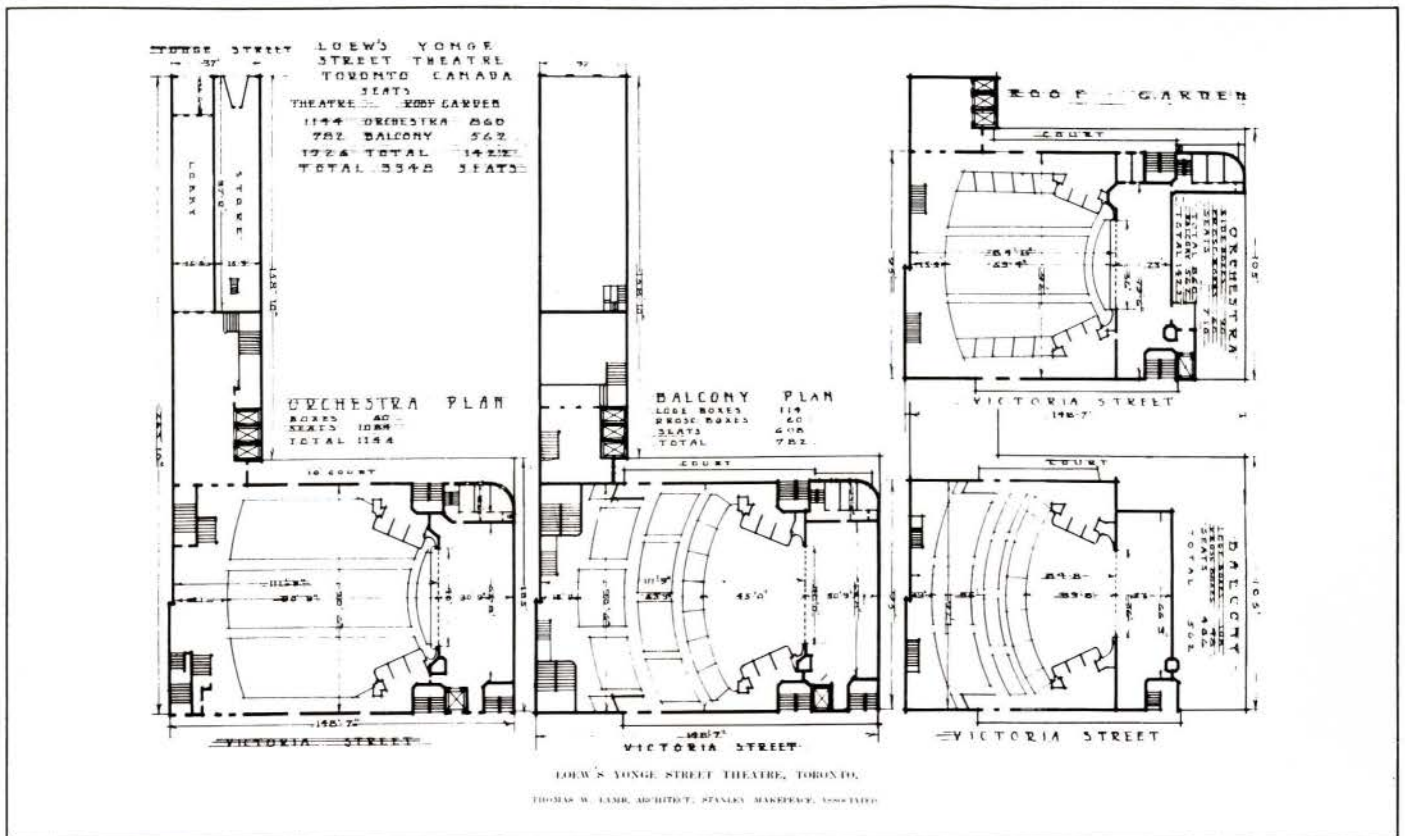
Floor plan of Loew's Yonge Street and Winter Garden theatres. (Construction)
